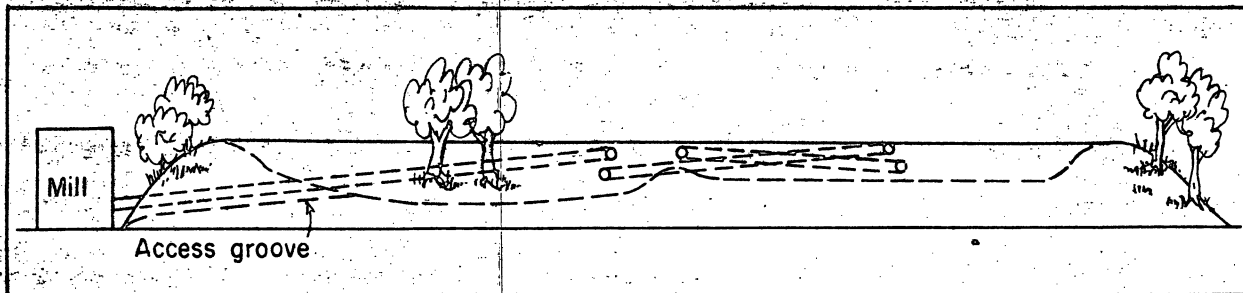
Plan view shows initial layout for construction of a hill of refuse.
